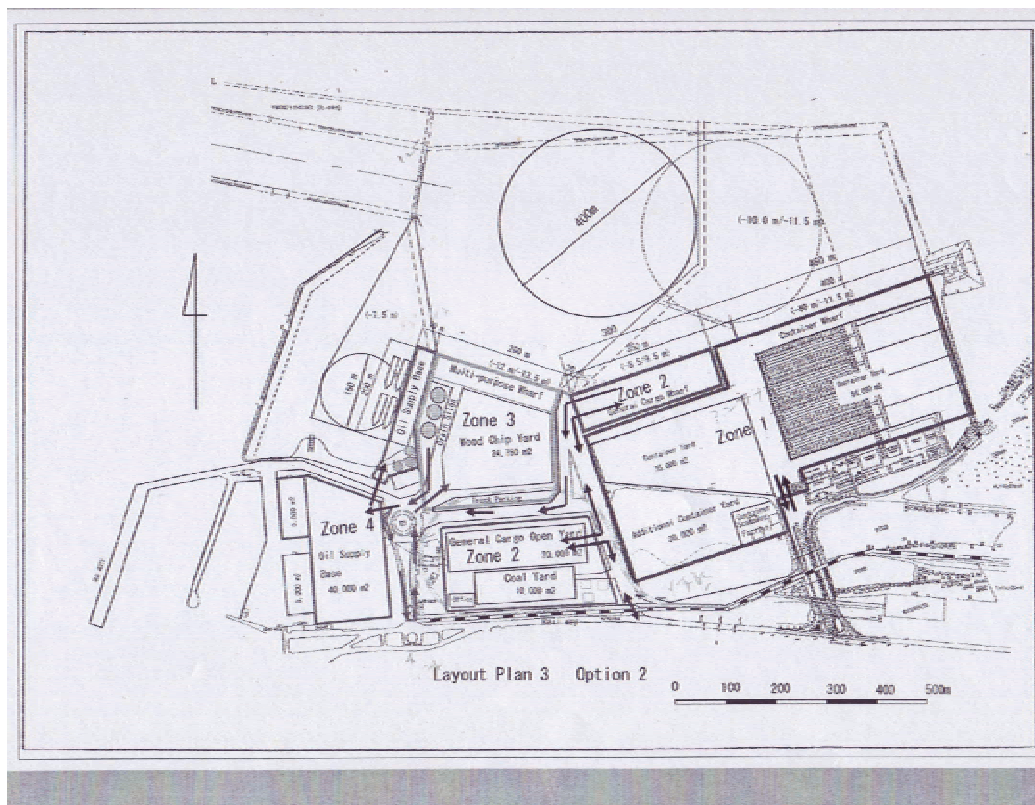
Layout of New Bulk Terminal (source: PAS)
